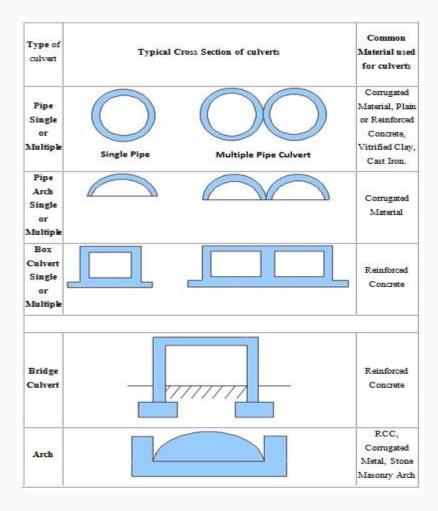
Common Culvert Types. (Source: http://www.aboutcivil.org/culverts-and-its-types.html)
